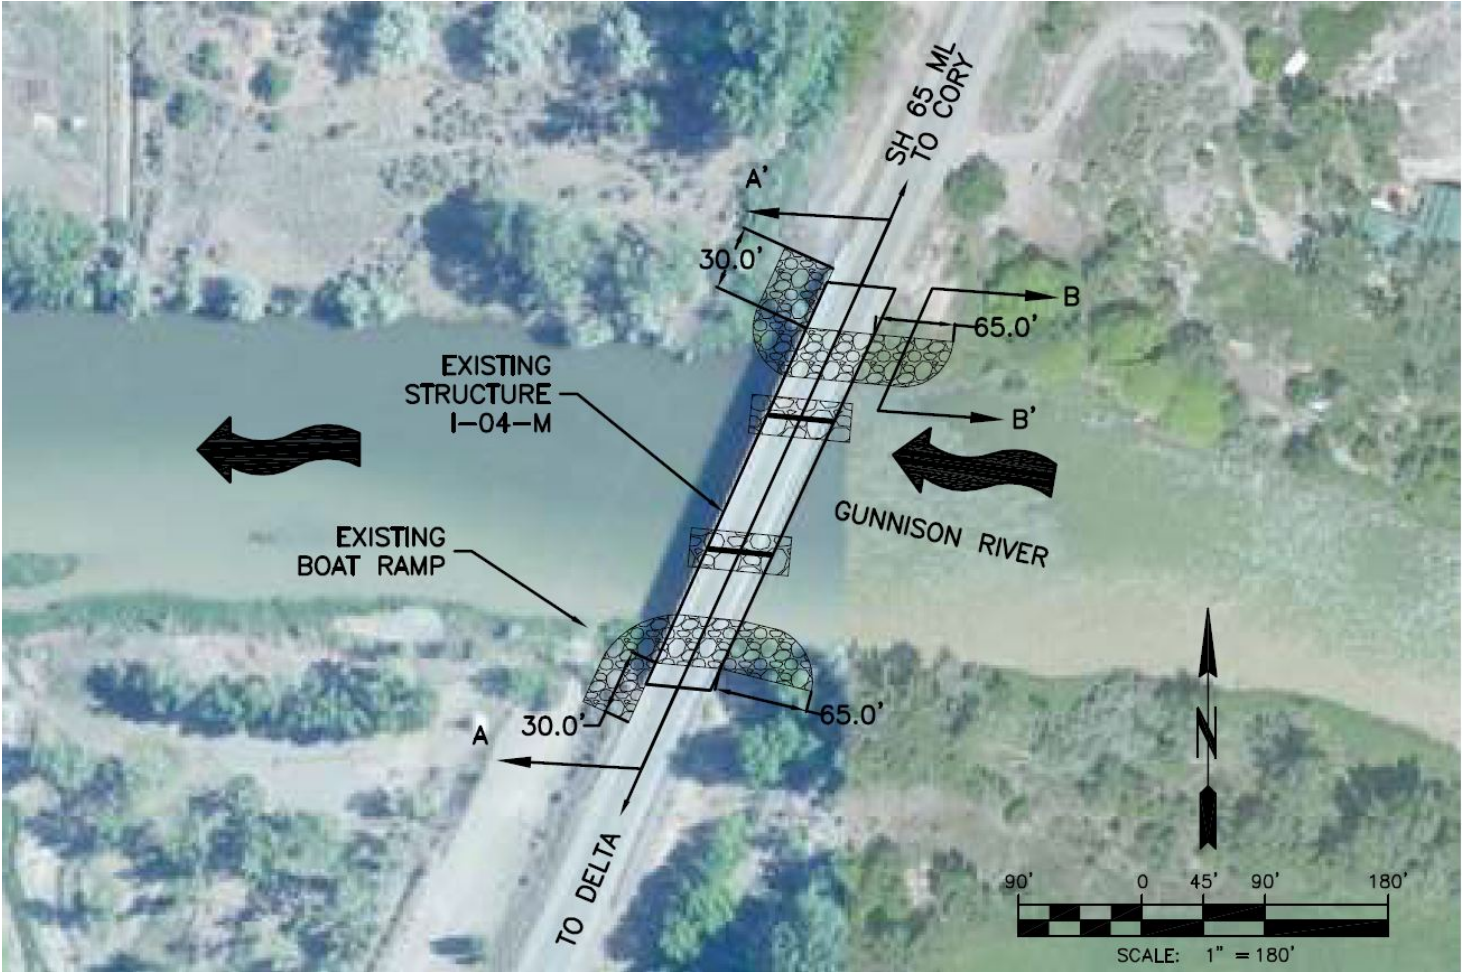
Plan view of Bridge I-04-M with recommended hydraulic scour countermeasure locations
